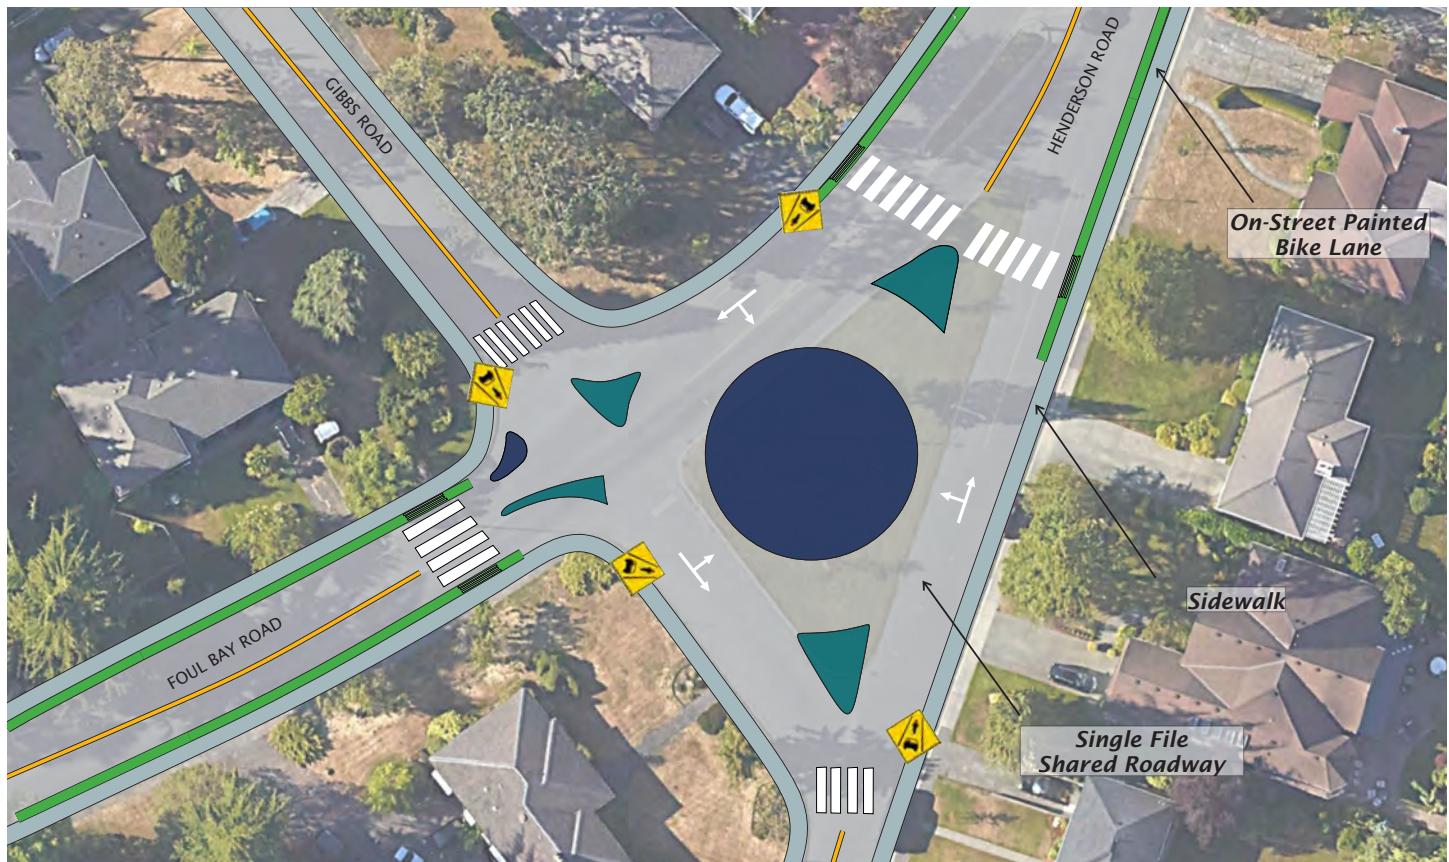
Aerial View of Conceptual Design at Foul Bay Road & Henderson Road
